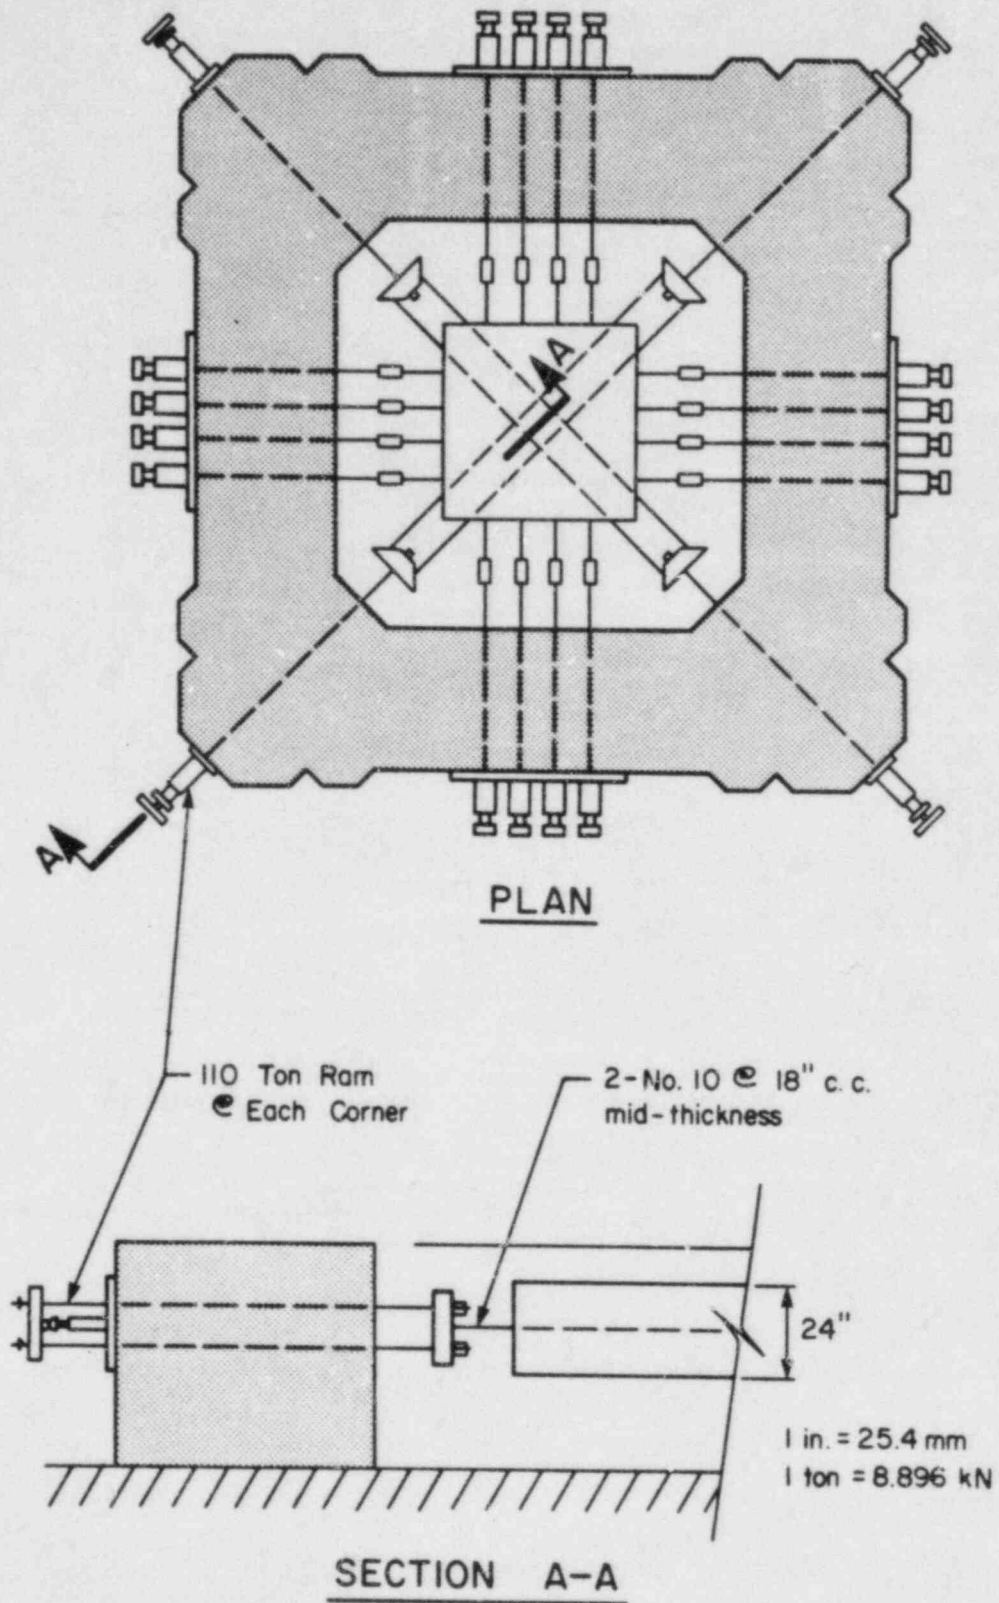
Biaxial and Biaxial Plus Diagonal Loading Systems for Half-Thickness Concrete Wall Specimens
